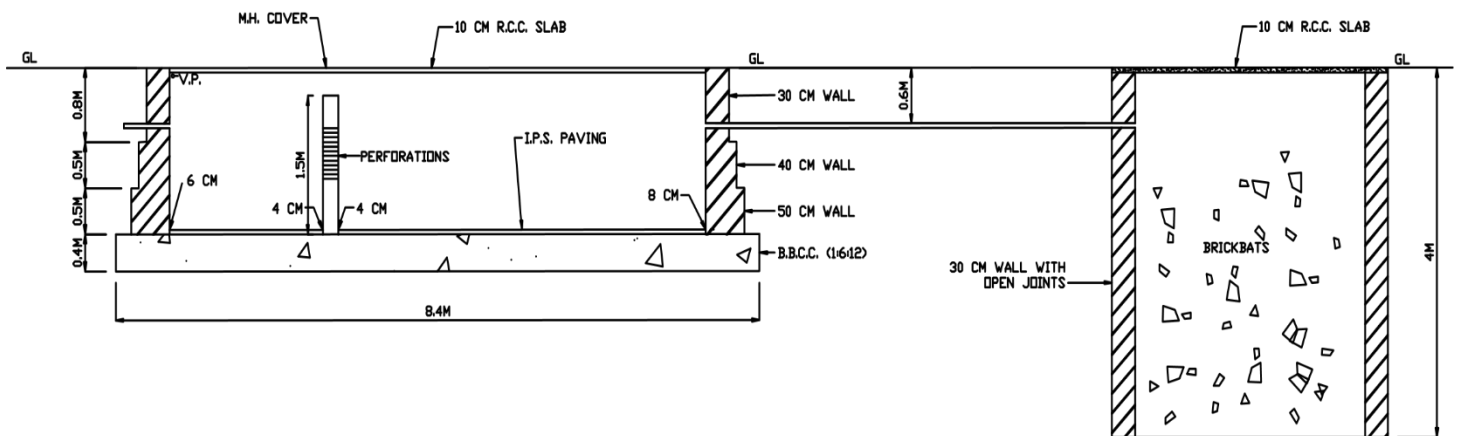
(b) Soak pit & Septic Tank Section
